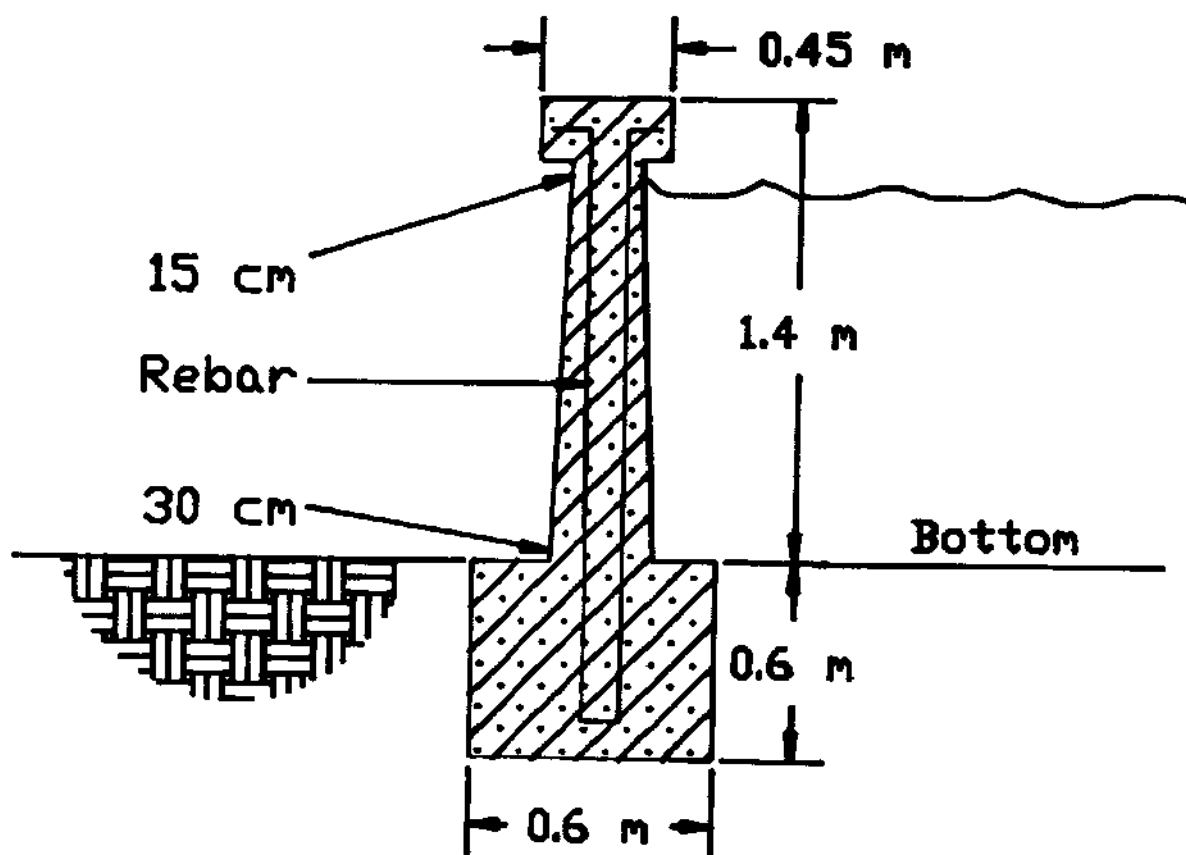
Cross-section of reinforced concrete wall at farm 6.
